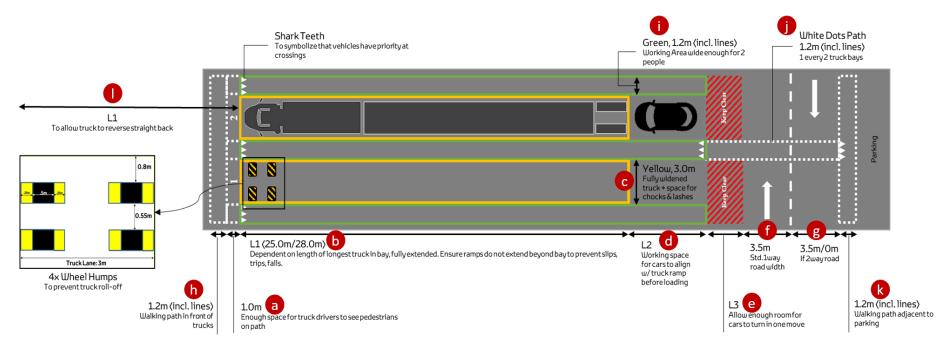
Layout of a truck loading area – straight-reverse-in type.
